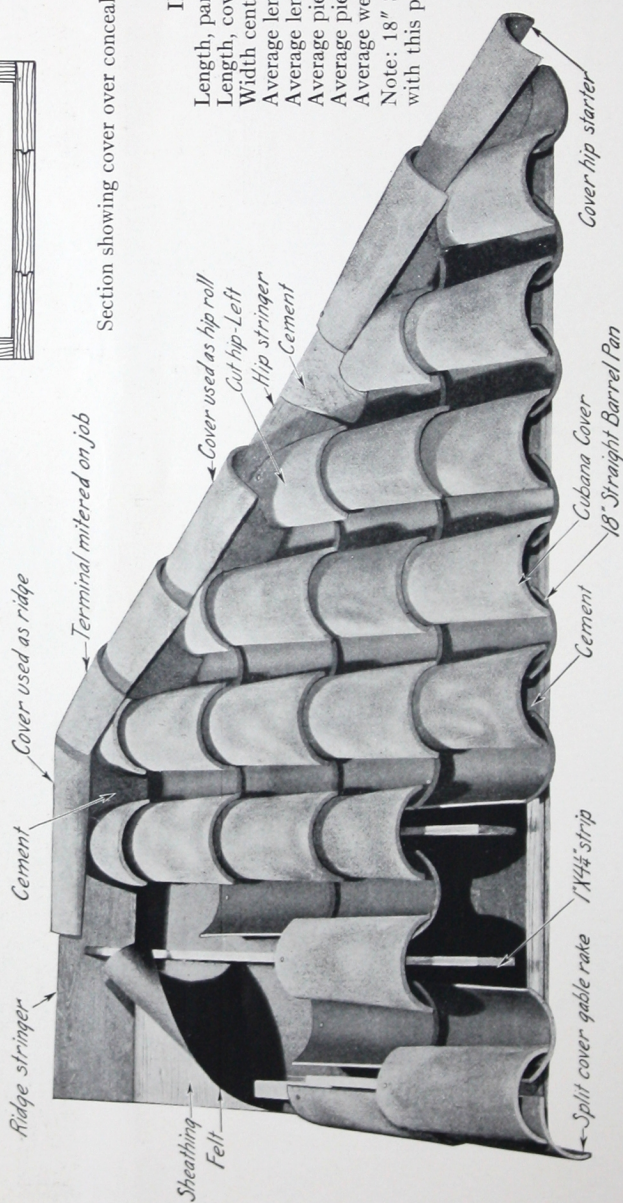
# DETAILS OF IMPERIAL 18" CUBANA TAPERED MISSION TILES AND FITTINGS
